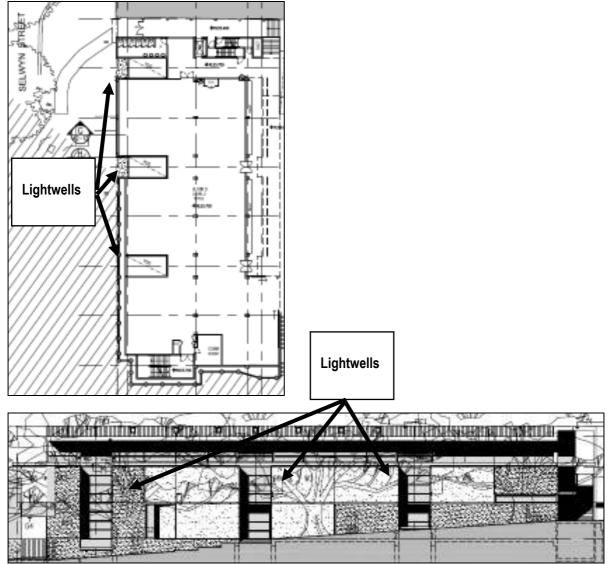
Floor plan and western elevation of Building D illustrating light wells
